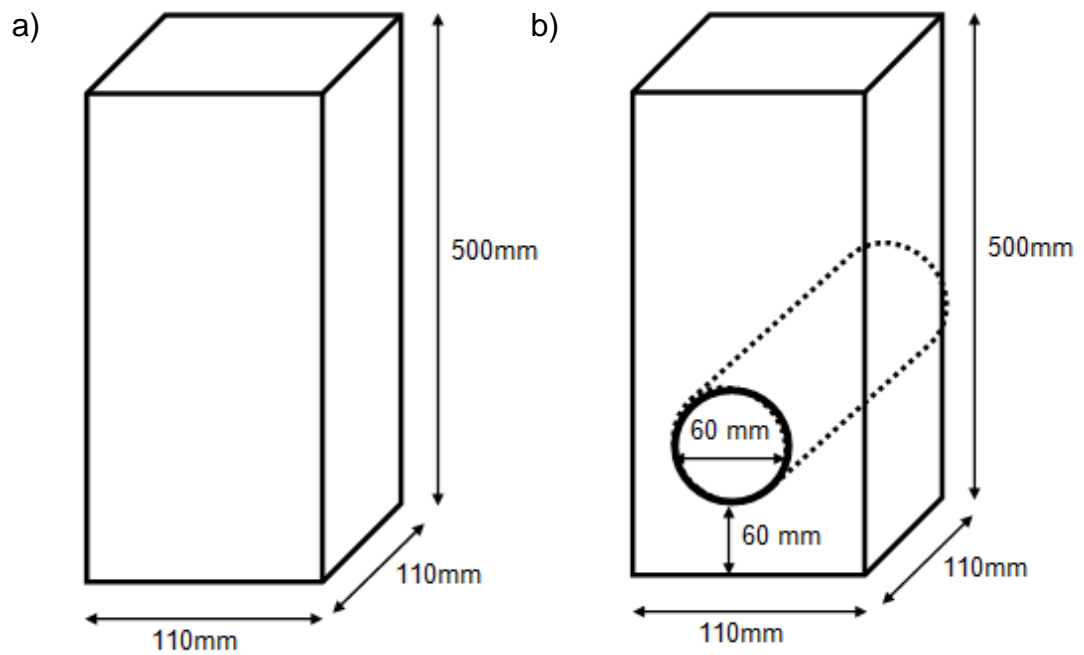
a) blank box section and b) turbine opening box section as used to create the front seawall of the TRS structures. (Not drawn to scale).
